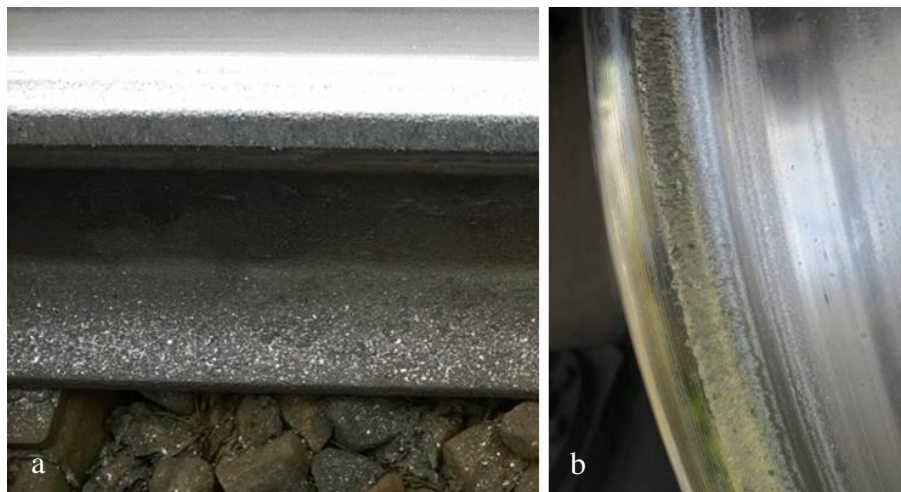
Photograph of severe wear at rail gauge wheel flange contact. Particles at rail foot (a) and of severe wear on wheel flange (b).
